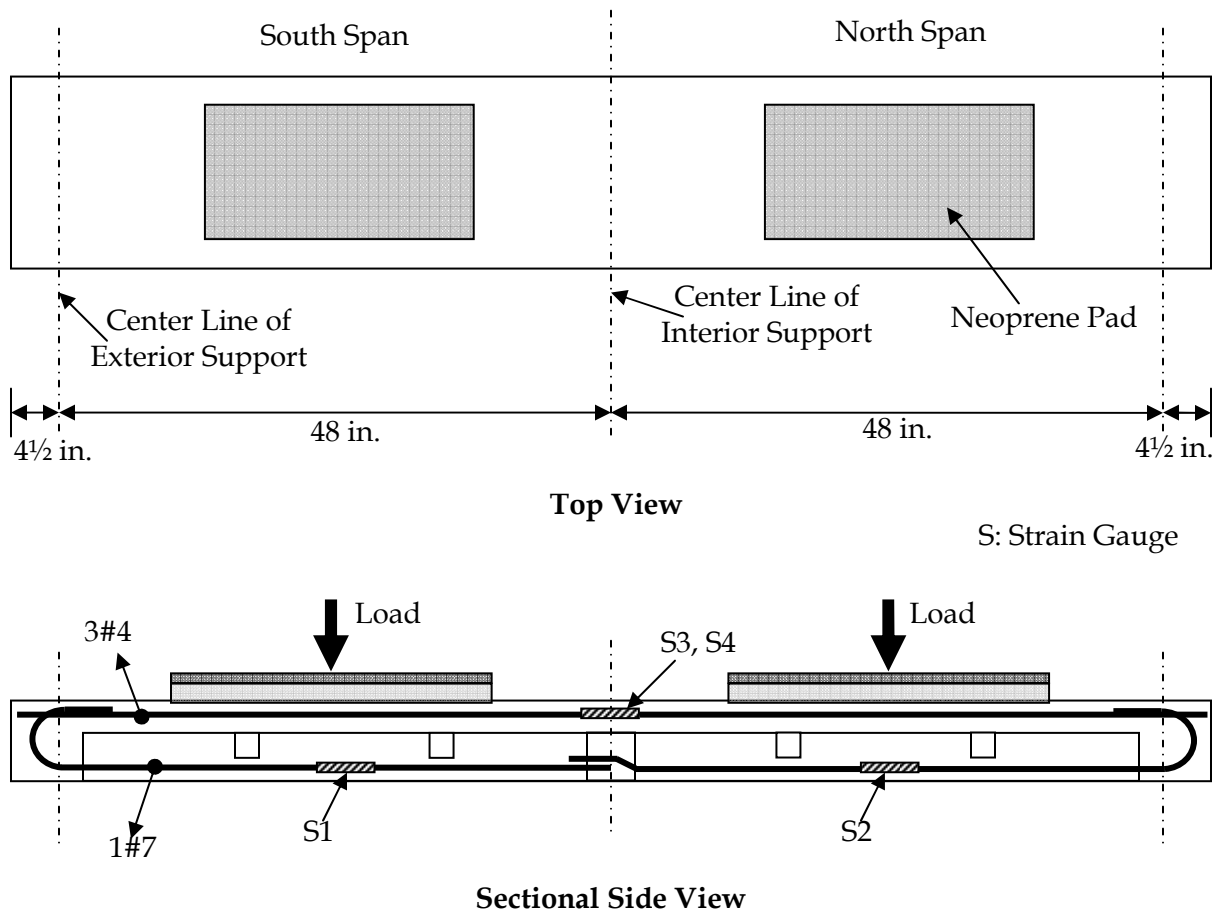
Instrumentation Plan and Loading Configuration for Specimen 1T2S
